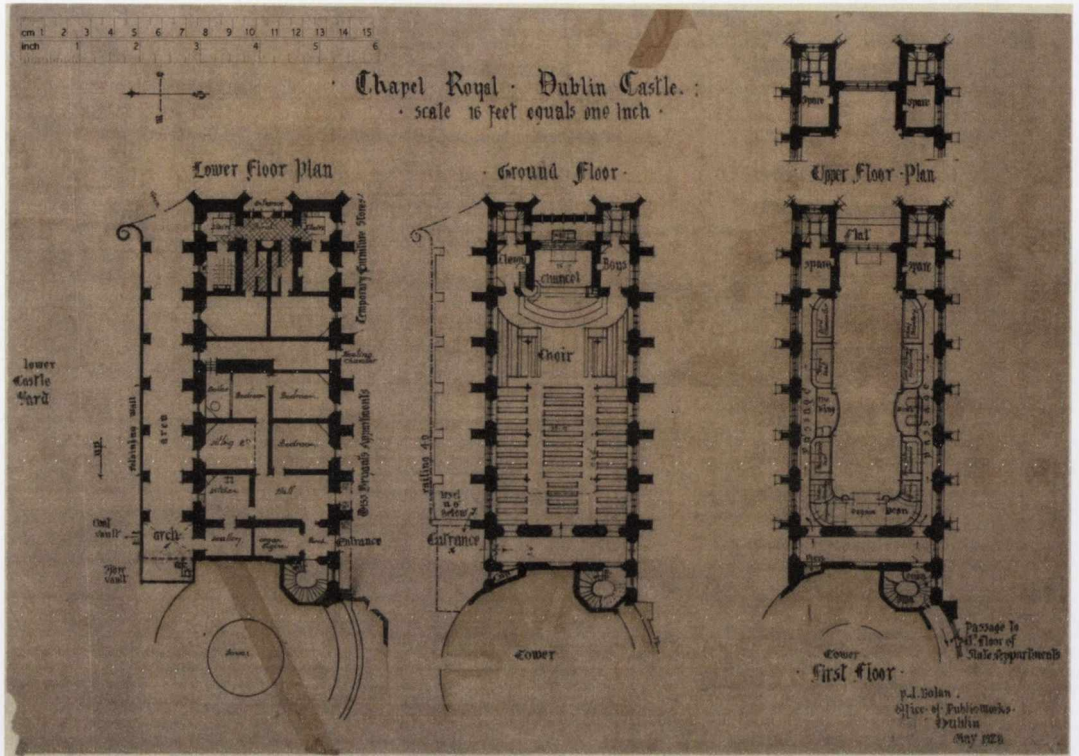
Castle Chapel, Dublin Castle, basement, ground floor and first floor plans, May 1928, OPW drawings, U16 8, courtesy of Office of Public Works. The drawing shows alterations since 1815: central seating on the ground floor had been added by 1849, the central pulpit replaced by one at the north side of the chancel steps in 1860, the seating allocations on the first floor were revised for the visit of King George V.
